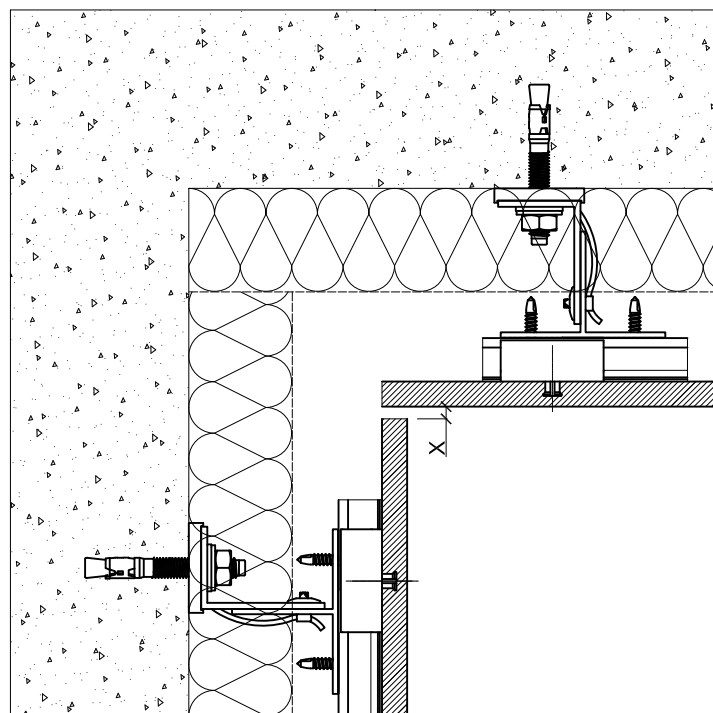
section (horizontal) of open seam with concrete expansion joint
